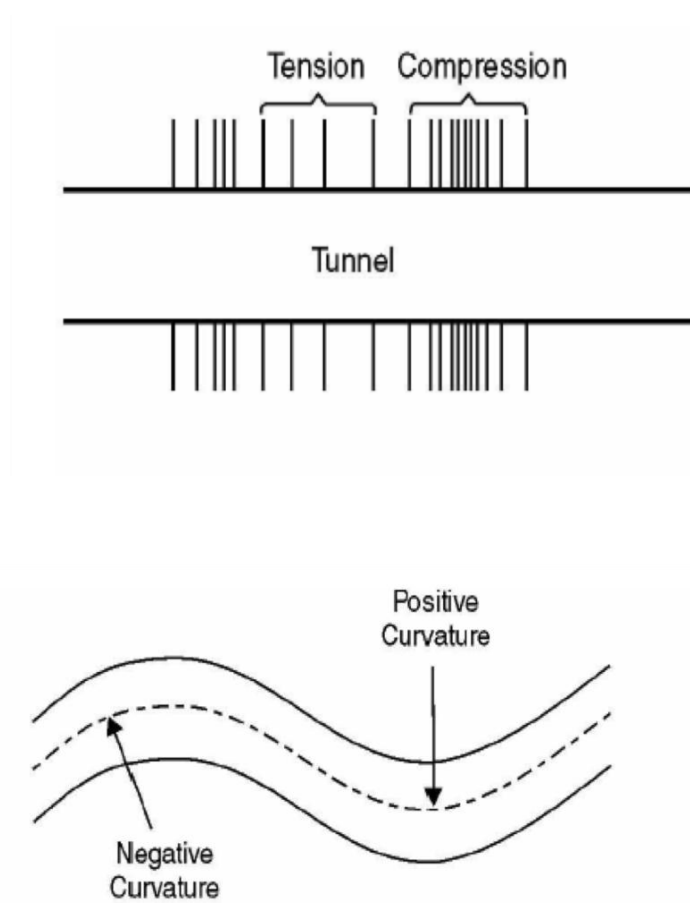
Axial and curvature deformation of tunnels under seismic loading (Owen and Scholl 1981)
